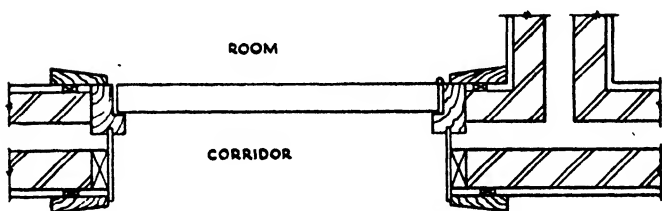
METHOD OF BRIDGING CAVITIES IN DOUBLE CONSTRUCTION AT DOOR AND WINDOW OPENINGS
